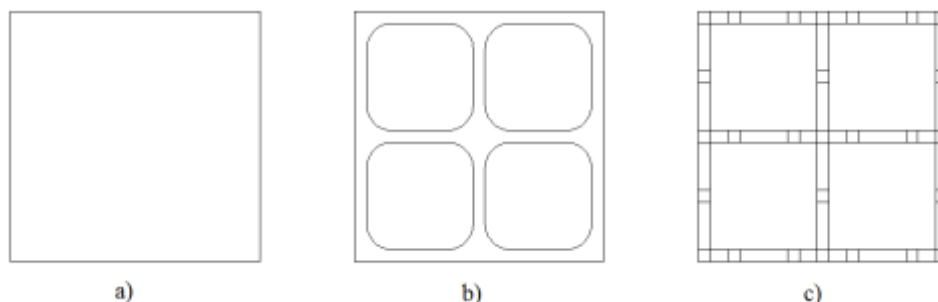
The tested prototypes, a) Solid Plate; b) Biaxial Geogrid; c) ICB-GGR.
